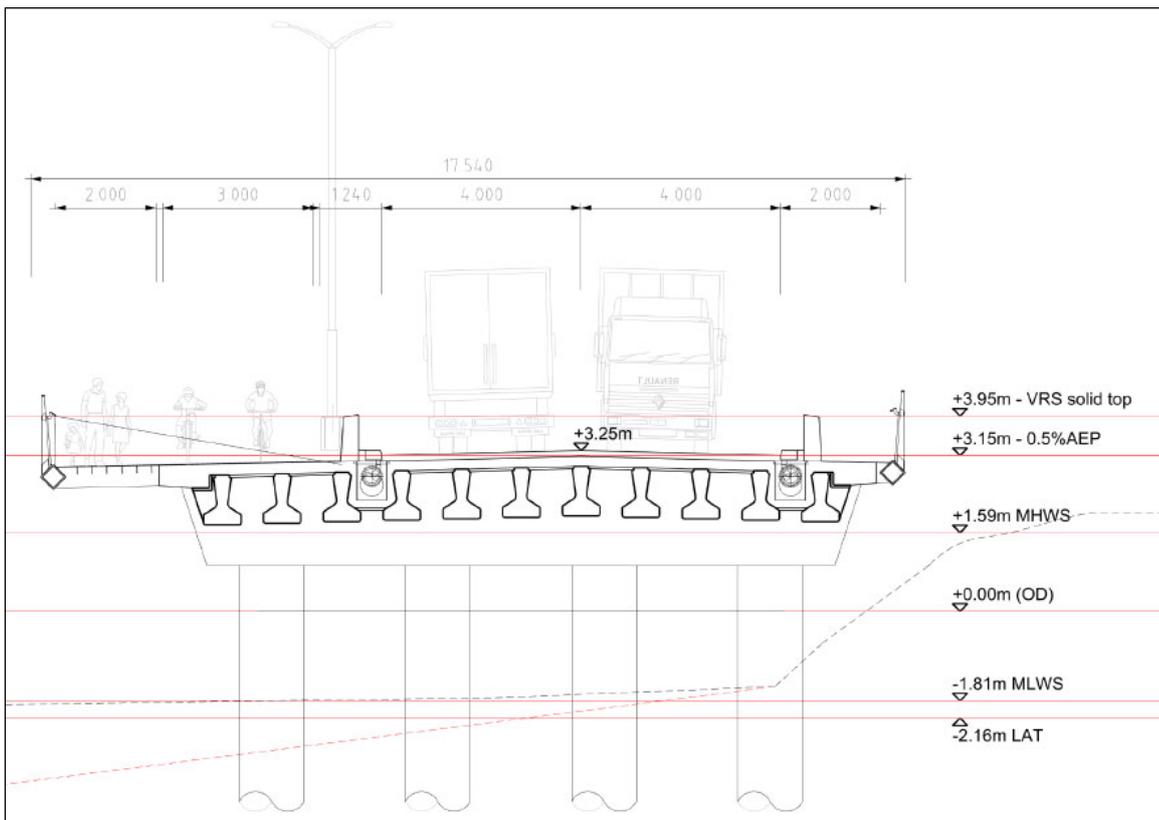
Extract from SPAR Viaduct Typical Cross-section
